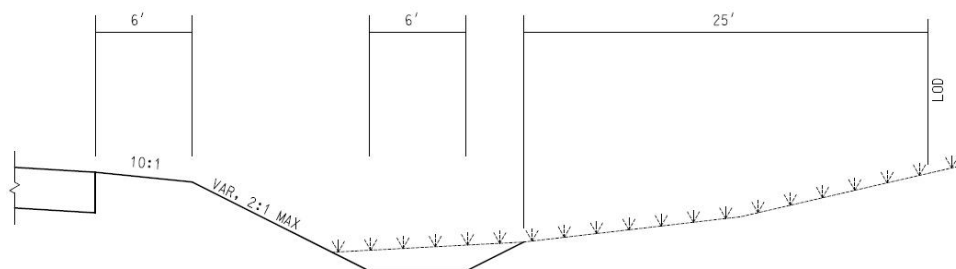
Roadside Grading Typical Section (Fill Slope with Ditch)
